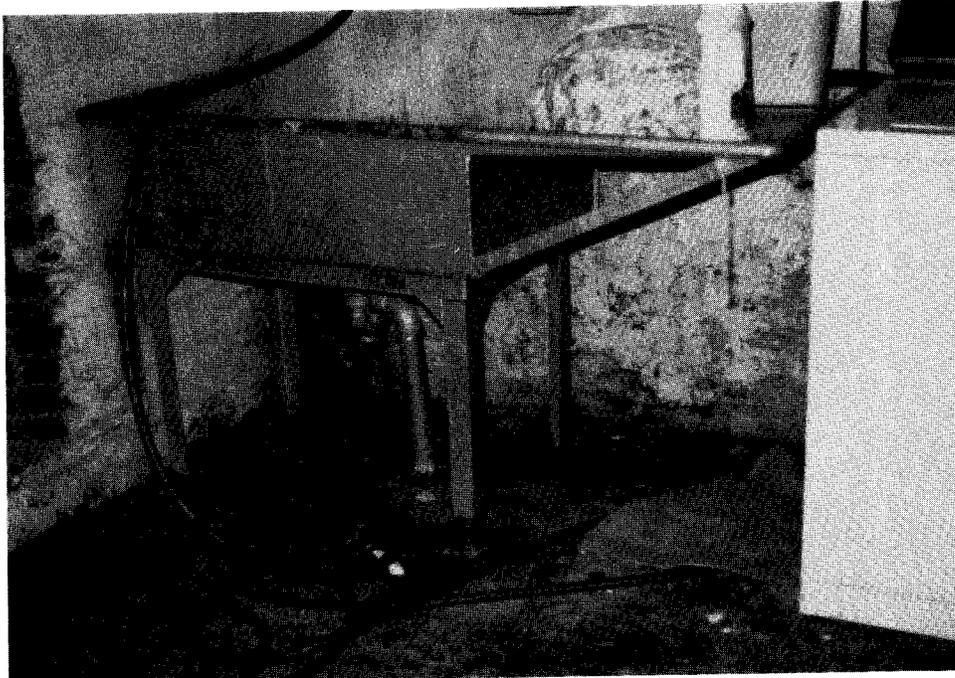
Keeper's Dwelling, ponding of water on floor at east wall of basement.
